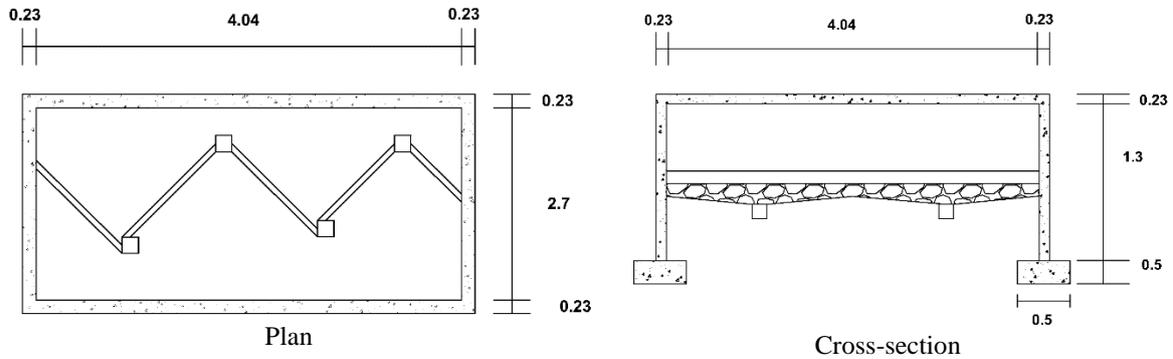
Plan and Cross-section of designed Sludge Drying Bed (dimensions in m, not up to the scale)
